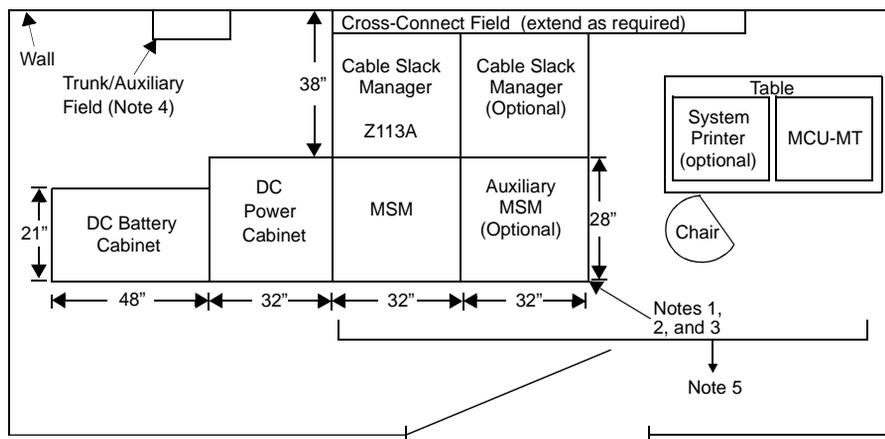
Typical Floor Plan for DC-Powered MCU with Single-Carrier MSM
